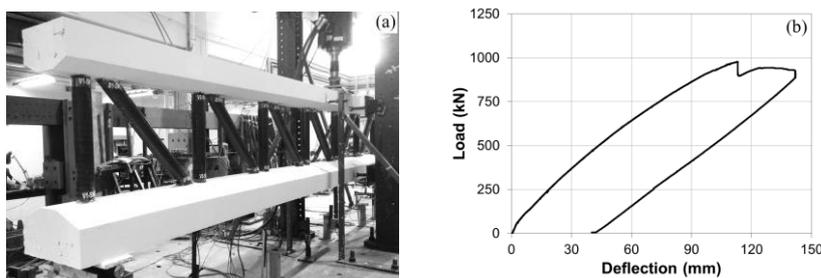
(a) Test setup and (b) load-deflection behaviour of the eight-panel truss girder.
